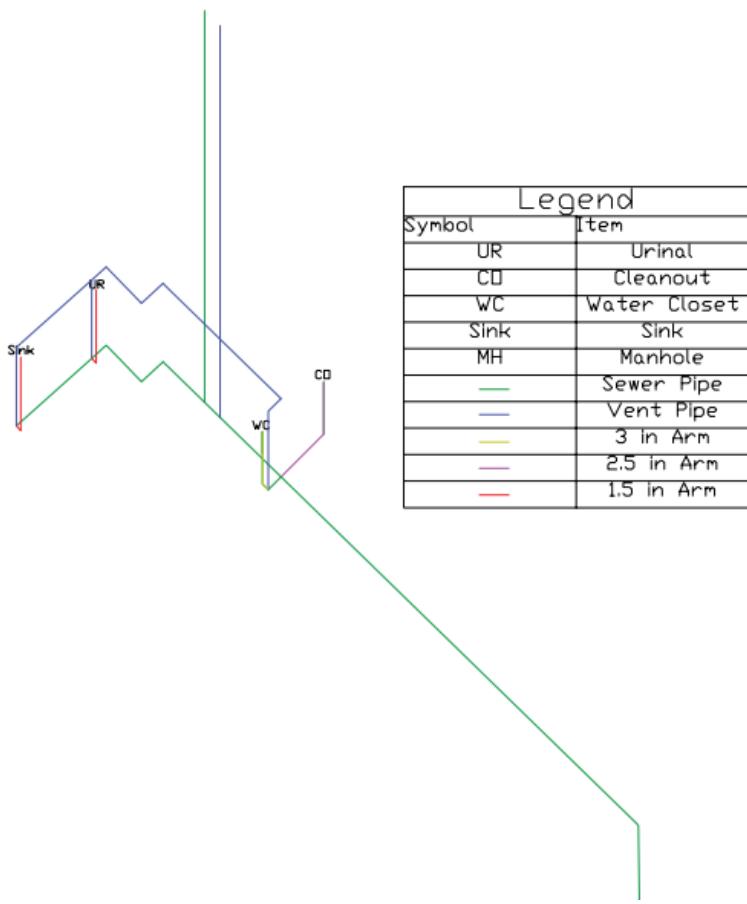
Isometric View of Sewer and Vent Pipes Floor 1
